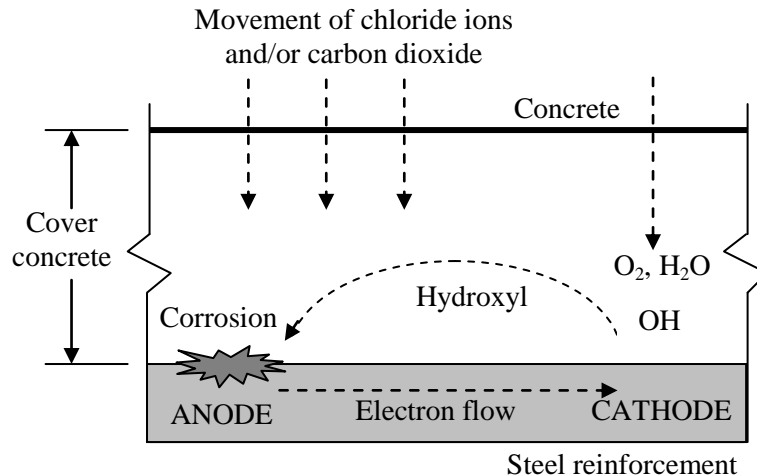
Corrosion process of reinforcing steel in concrete (Mackechnie, 2001)
